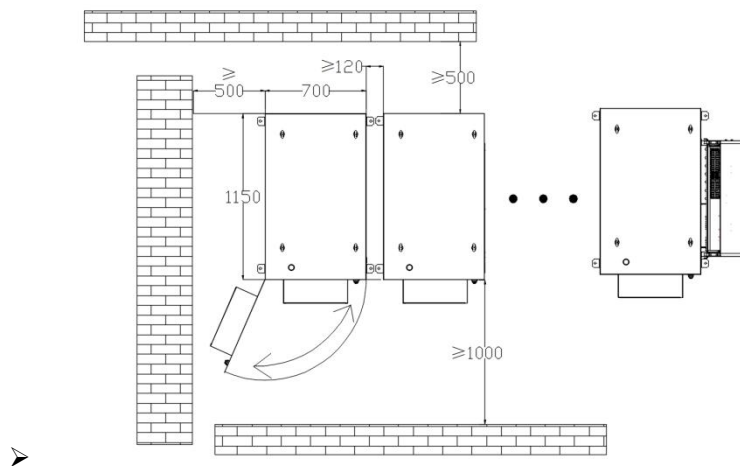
Schematic diagram of cabinet installation gap (unit: mm)
